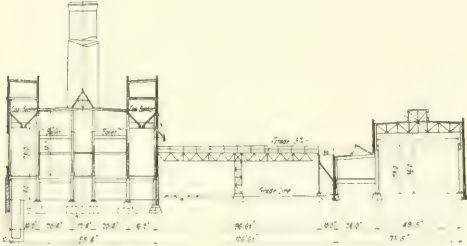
ELEVATION OF POWER HOUSE AND FORGE SHOP
